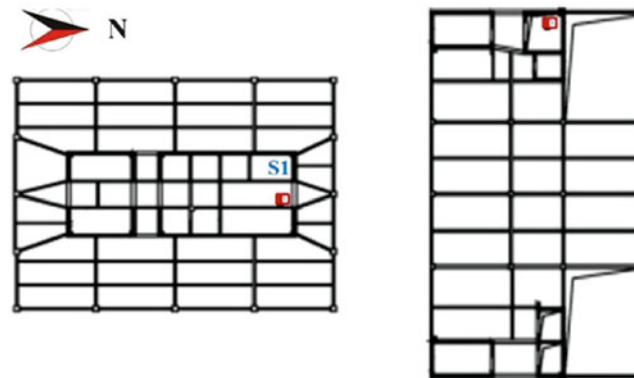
Setup plan from south elevation view and top view of two towers
